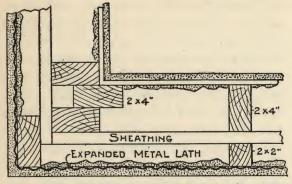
Methods of constructing the corner of a cement plaster house and the use of expanded metal lath.
